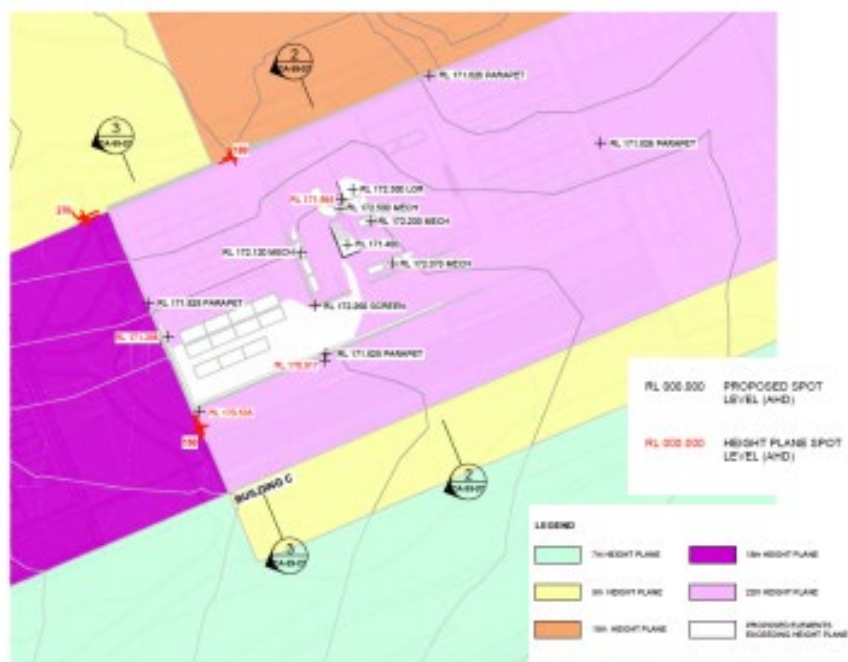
Height exceedance plan – Building C (Cox drawing DA-99-07)
